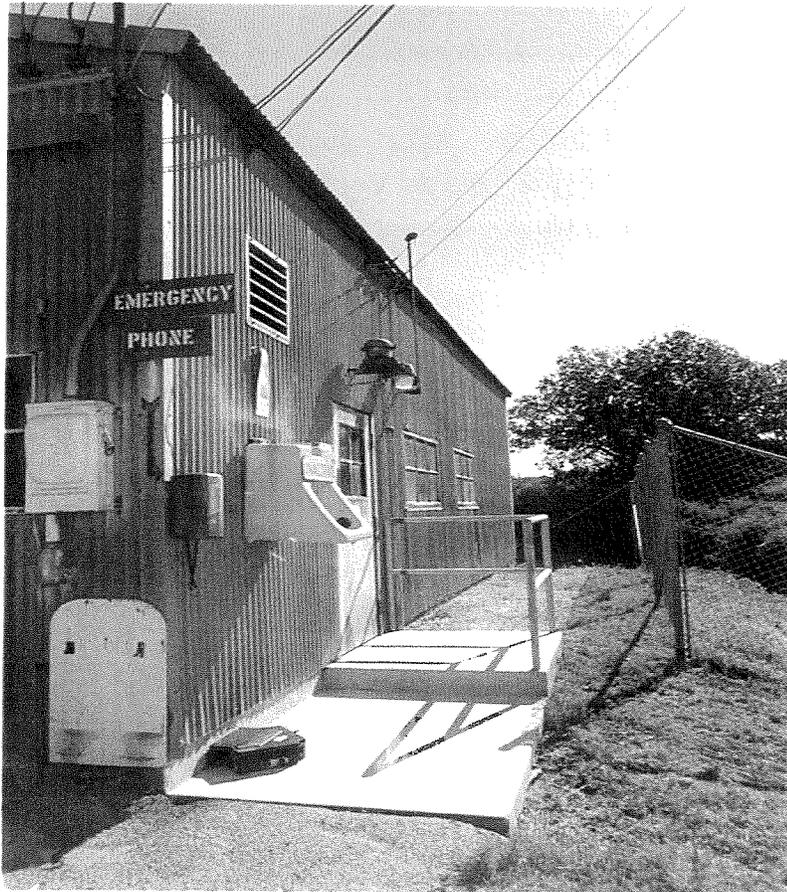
(Left): View of southern side of Building T029, looking East. Pedestrian entrance to building on south side.
